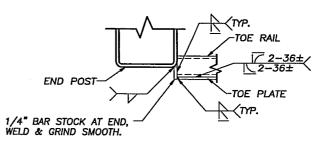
PLATE TO END T<u>ATTACHMENT DETAIL</u>
